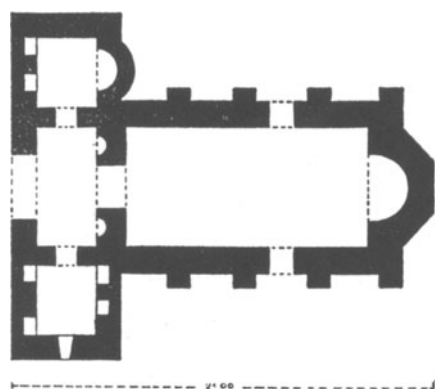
CHURCH AT RUJKOVAC. PLAN
